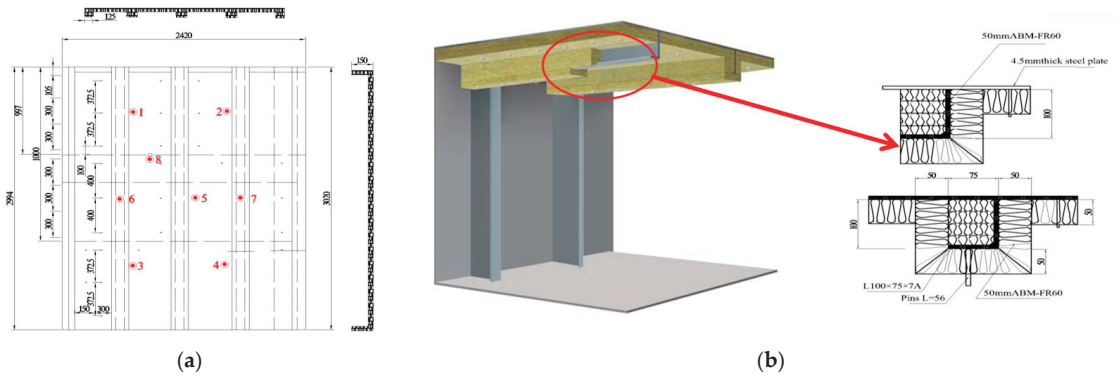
(a) Location of thermocouples on deck A-60; (b) section of A-60 deck specimen. (unit: mm).
